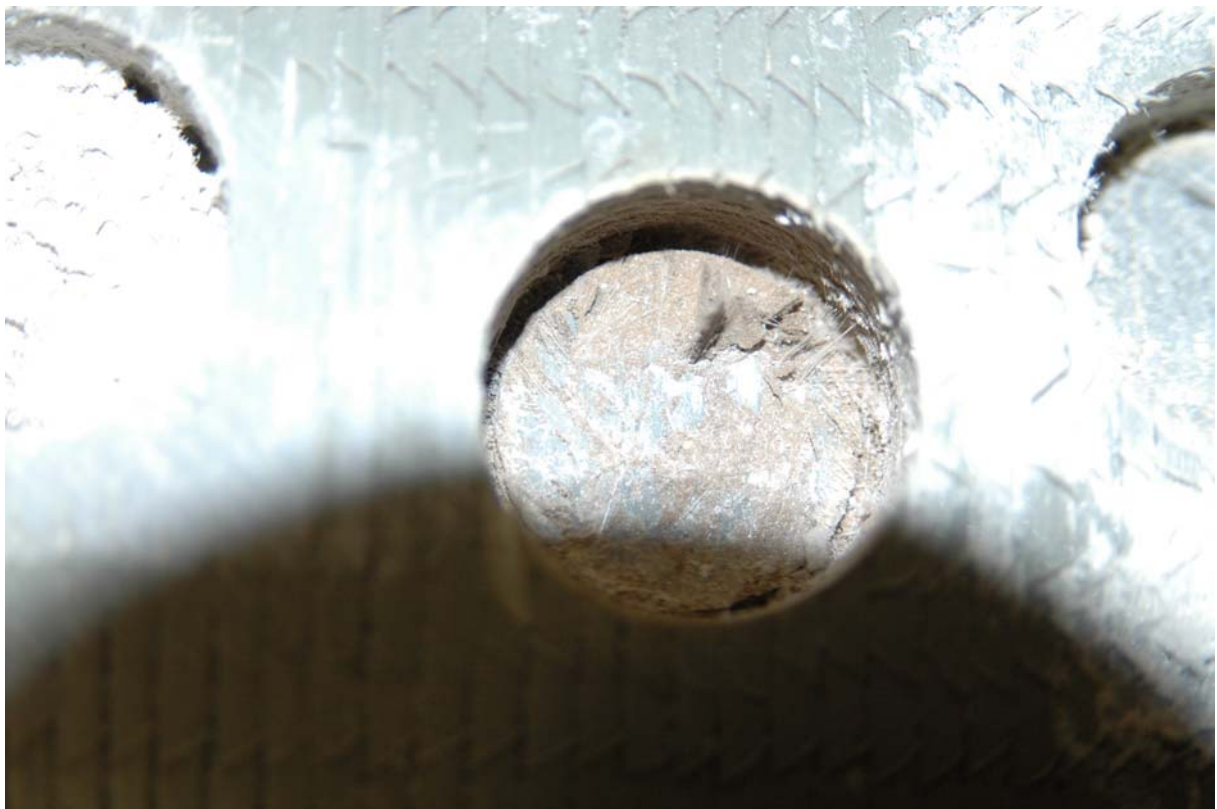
Photograph showing the fracture surface after pull-off test
